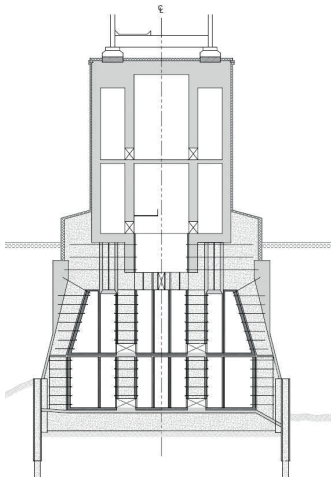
Rehabilitation of the pillar includes construction of new reinforced concrete walls on the internal sides of the walls to be attached to the existing structures with anchors through the mass concrete.
